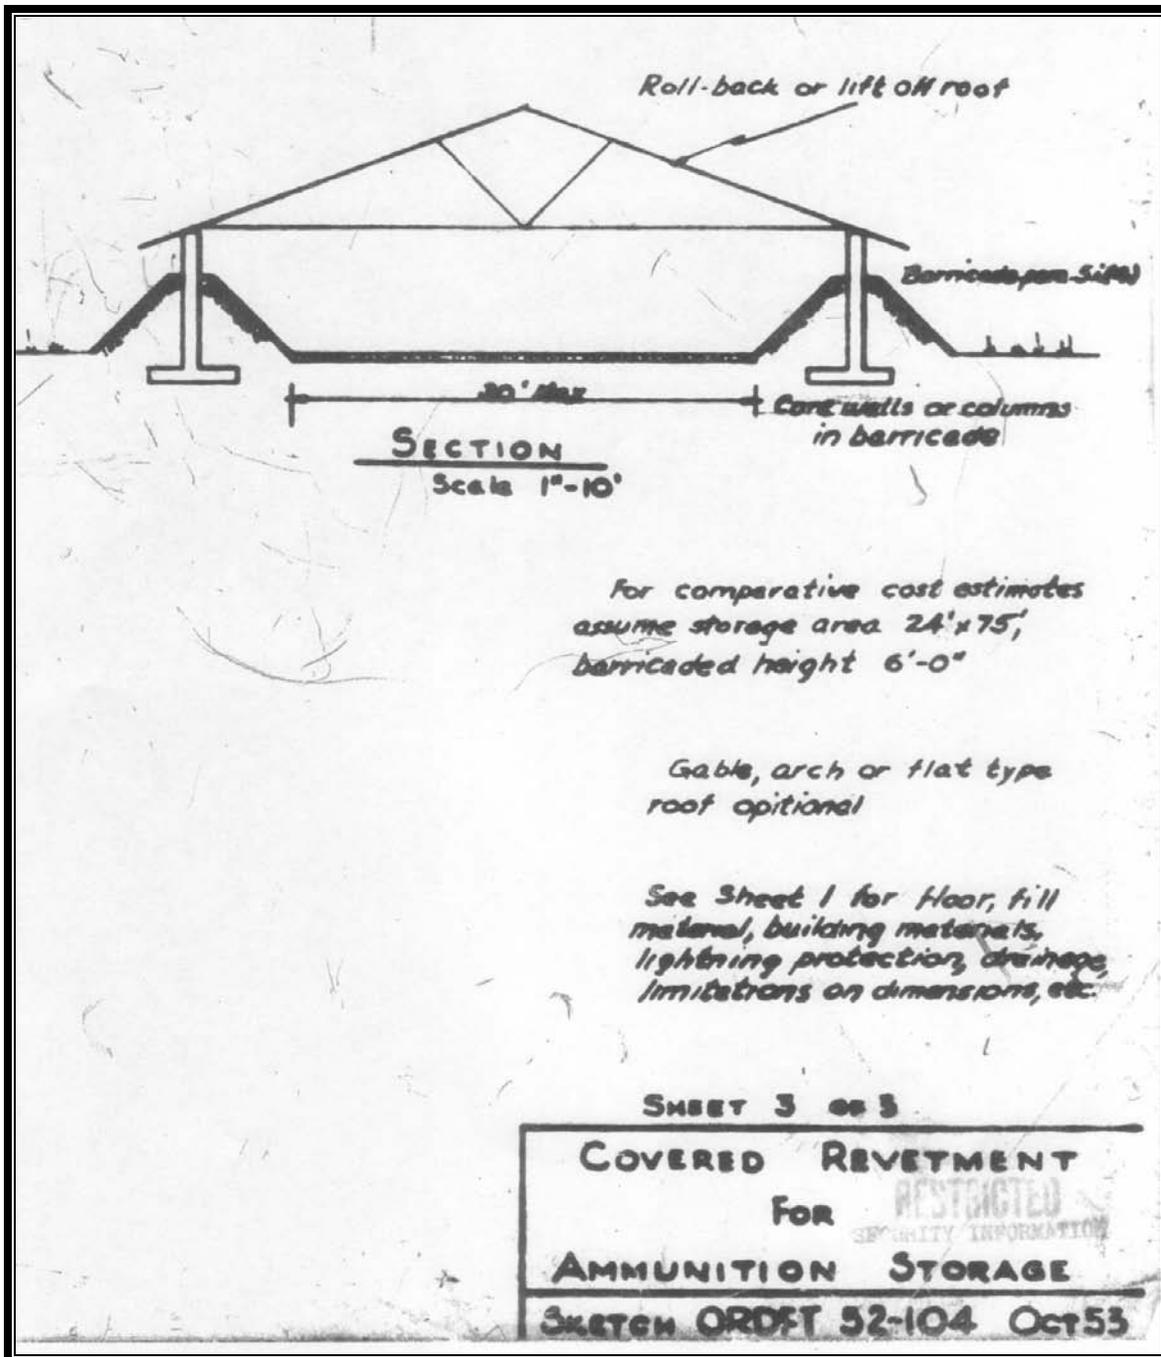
Plan for erecting coverings over open storage areas (Reed 1953a:n.p.)
